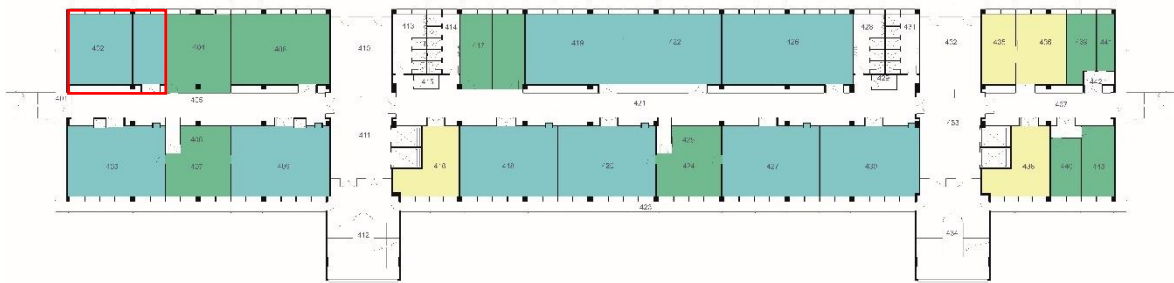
Architectural plan of the fourth floor of C1 building at FCUL
